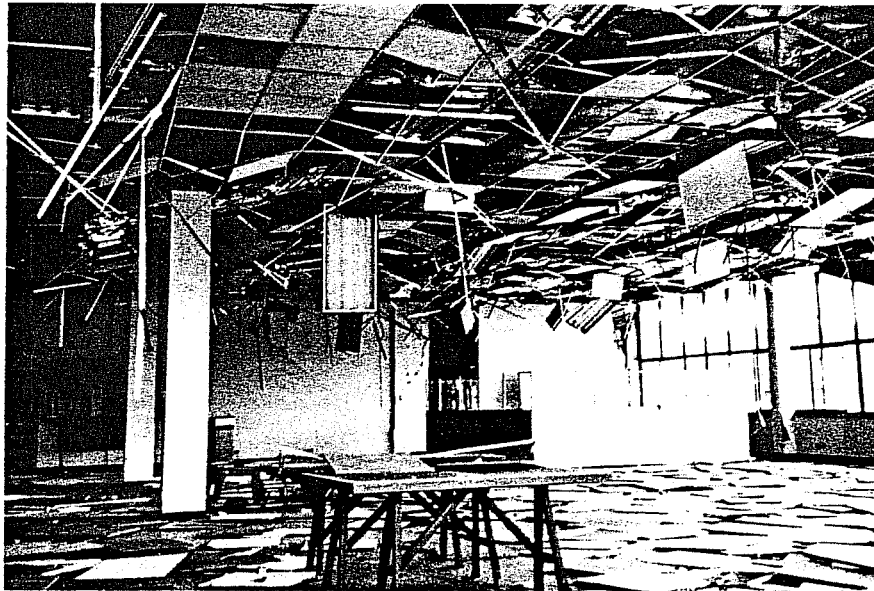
Damage to Nonstructural Elements: Collapsed Suspended Ceiling, Lights, and Ventilation Ducts (Ref. 7)
